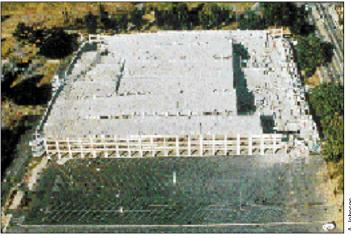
Interior columns failed and girders fell off supports in this CSU Northridge parking structure. Long Beach without an earthquake are symptoms indicating that independent and competent plan checking of such structures is needed. Since there is an inherent conflict of interest when plan checkers are hired by the managers responsible for completing buildings, they should be responsible to another level of government: state university buildings might be inspected by the Division of State Architect or a qualified local building department. The success of the truly independent Field Act plan check process for construction of public schools illustrates the importance of this factor (see figures 19 and 20).
